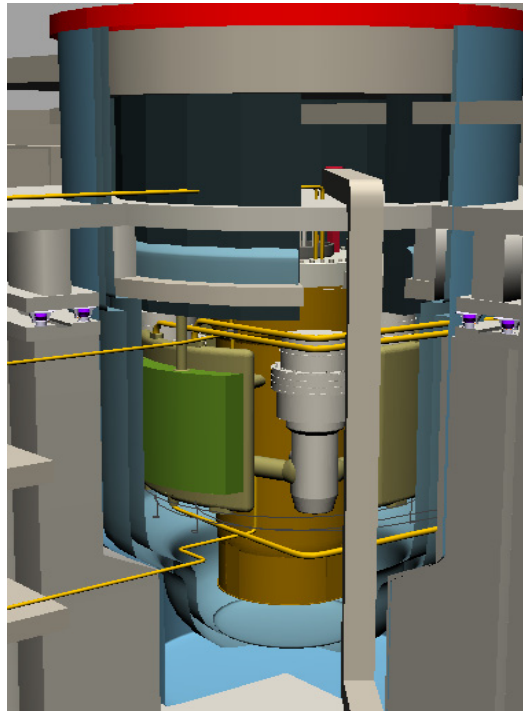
3D CAD Drawing of PEACER-300 MWe.
